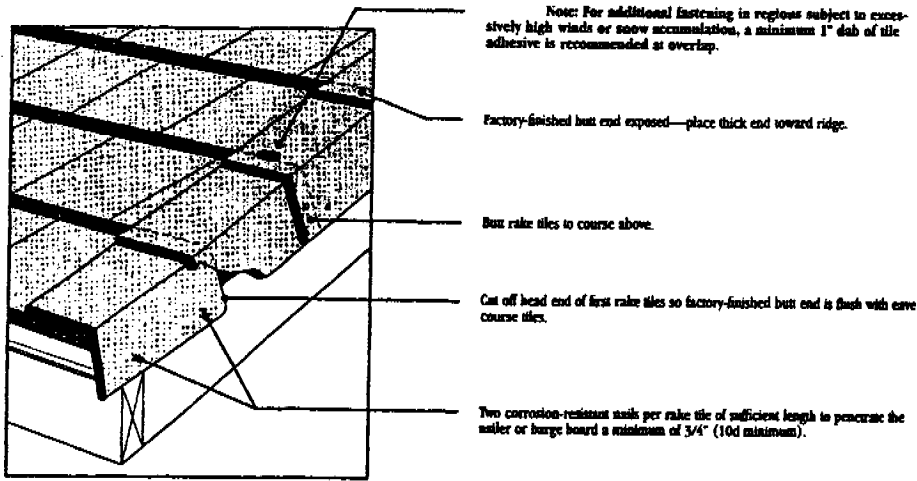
TYPICAL INSTALLATION DETAILS—(Continued)
